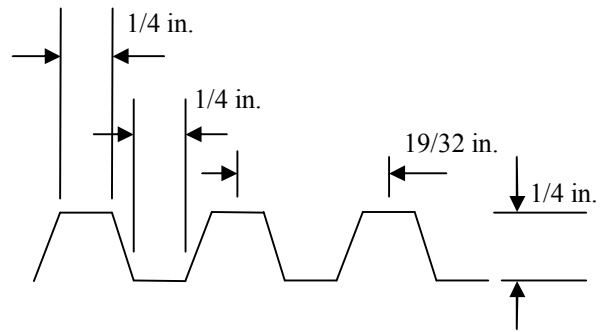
Dimensioned drawing of formliner used in creating fluted UHPC surface.
